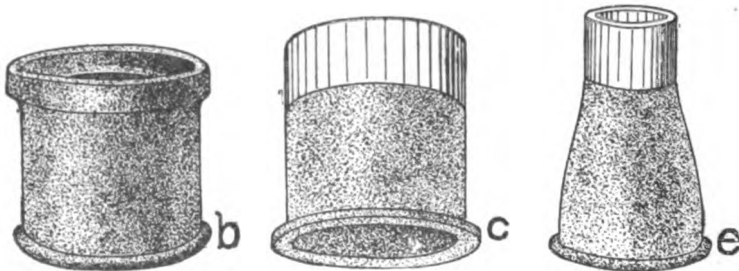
Brass Ferrules—*b*, Recessed or Hub; *c*, Straight; *e*, with Lead End Contracted to Make Joint with Smaller Pipe.
